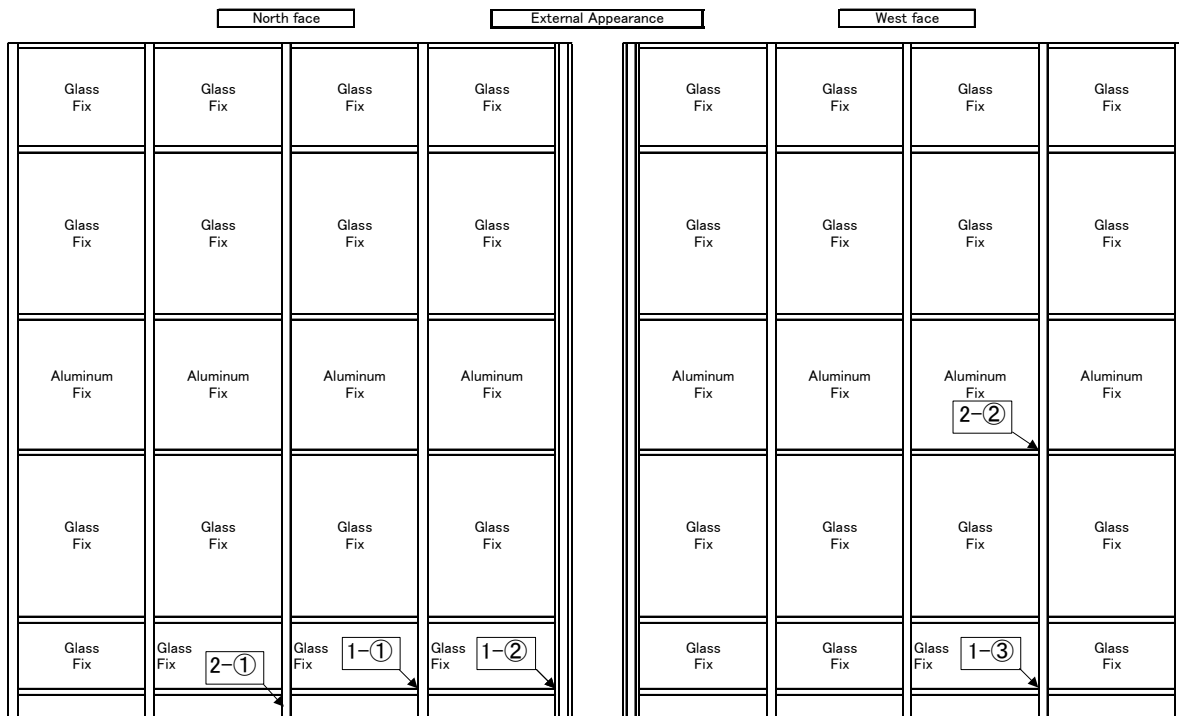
Place of damage of curtain wall in the test of Case 1) and Case 2)
